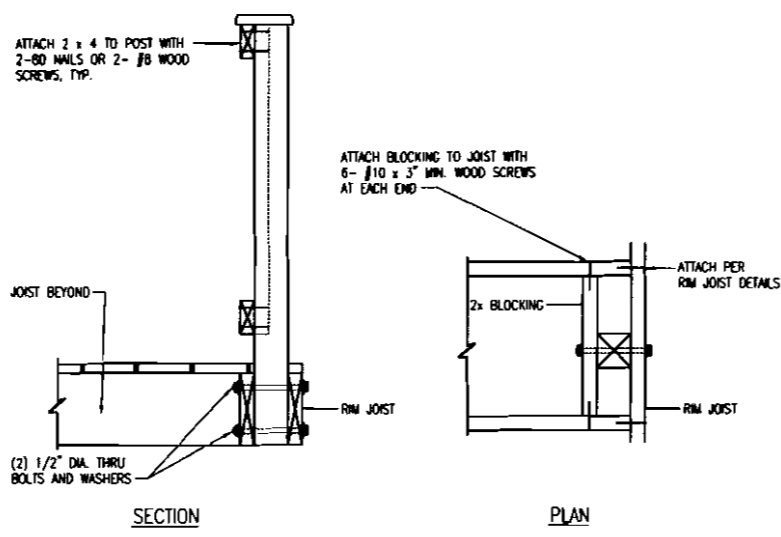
GUARD POST TO RIM JOIST DETAIL - OPTION 1
